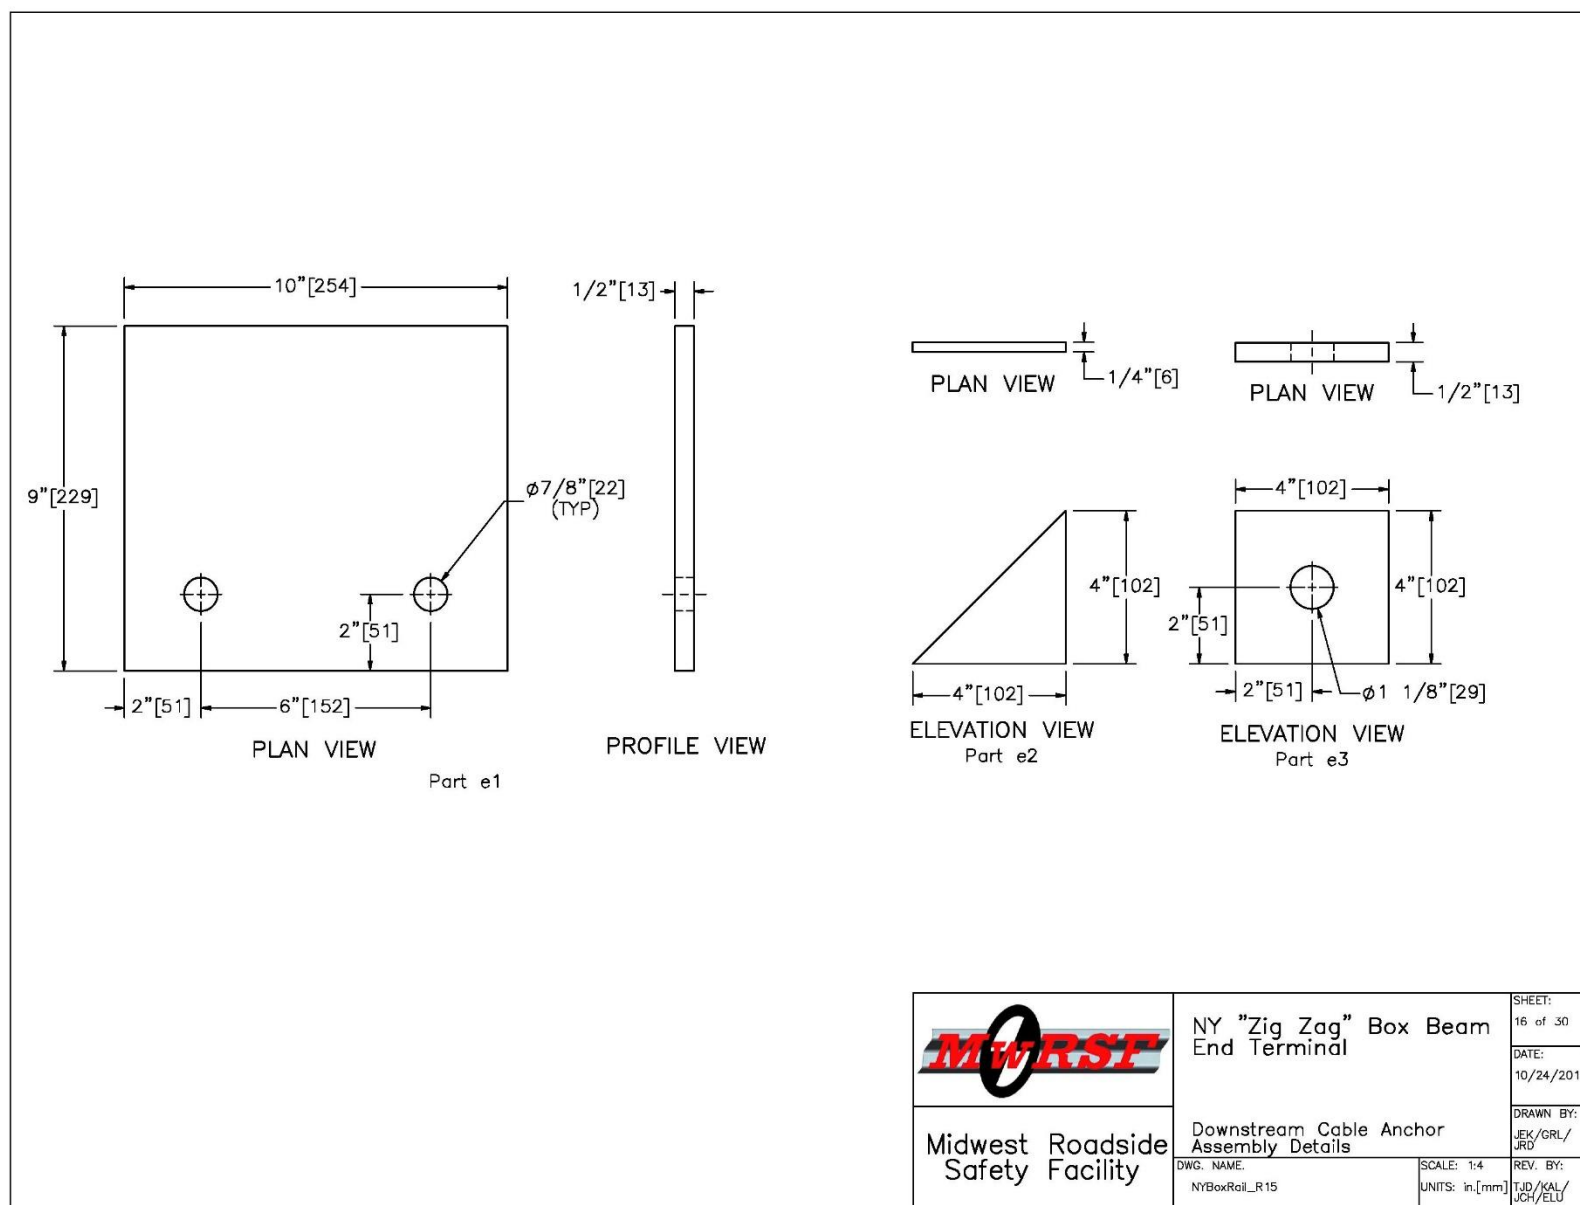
Downstream Cable Anchor Assembly Details, Test No. NYT-1
